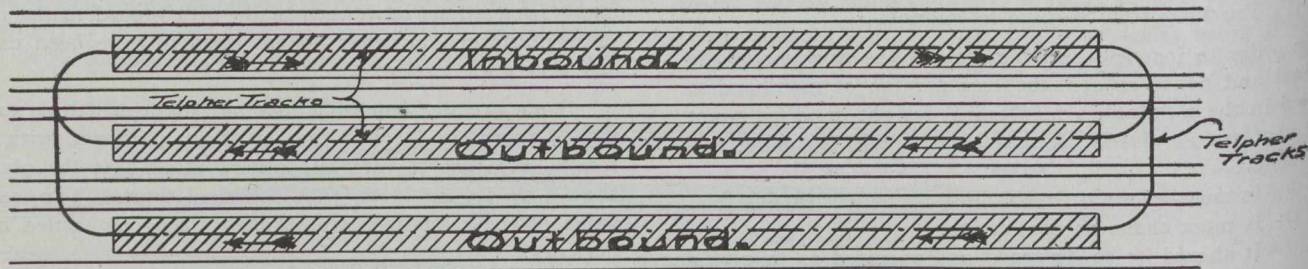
Plan Showing Telpher Tracks at Bergen, Sheds of Erie Railroad.
